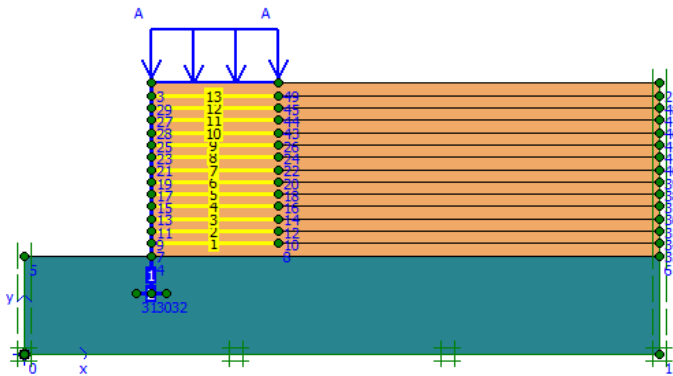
Reinforced Earth Retaining Wall with Loose Sand used as a Backfill Material
